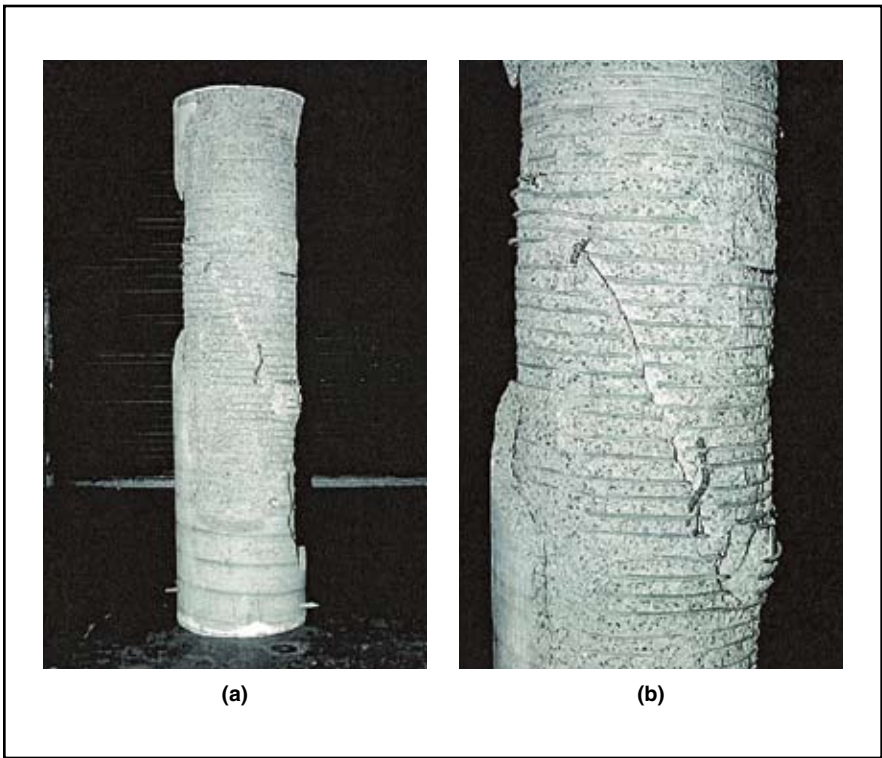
Post-test appearance of Specimen 24-C: (a) overall view; (b) close-up view of inclined failure plane.
